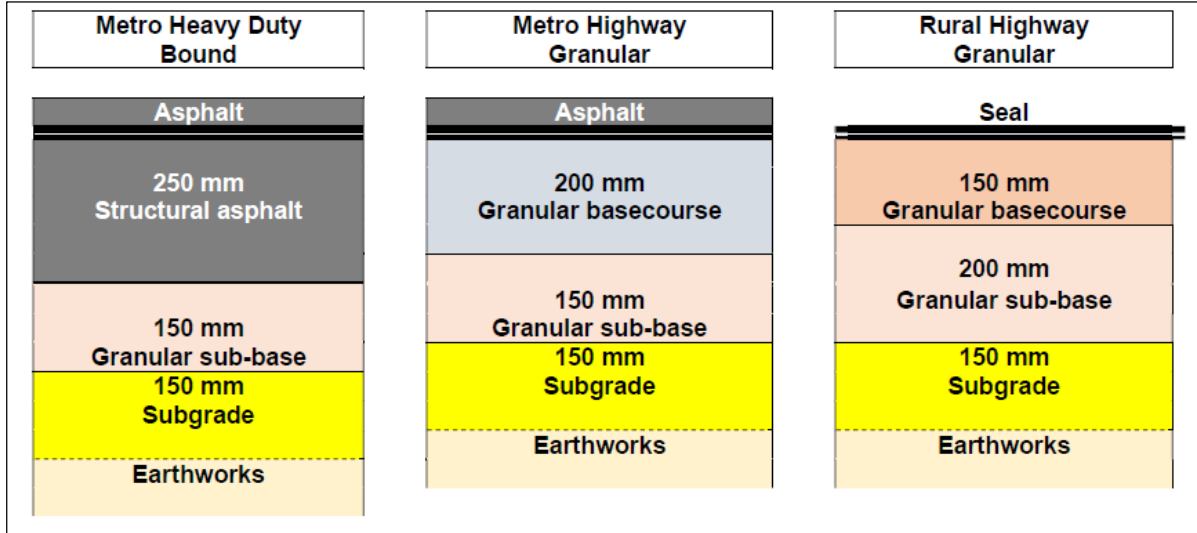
Typical Pavement Types and Example Thicknesses Applicable to Main Roads' Highway Network
